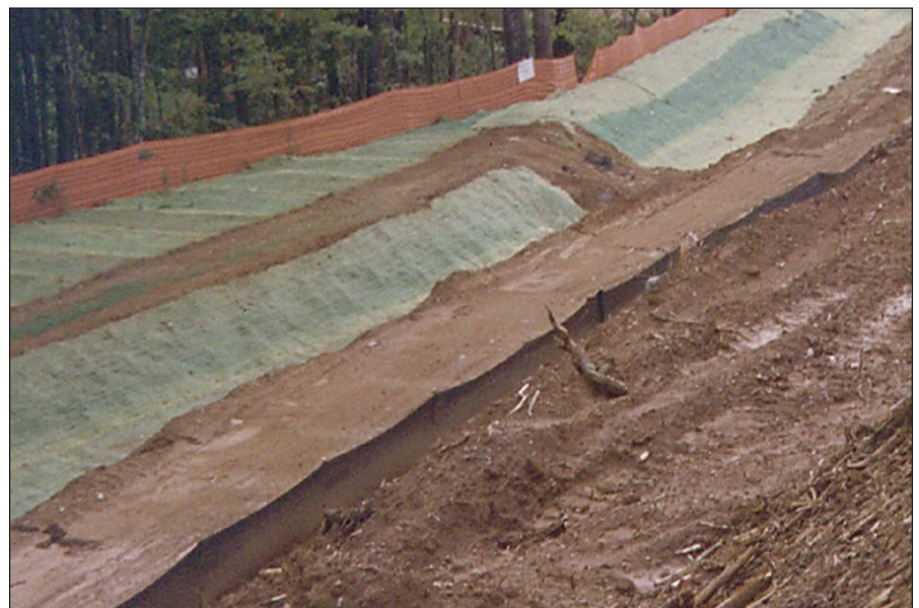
Gradient weep berm installed at a school construction site in Georgia.
